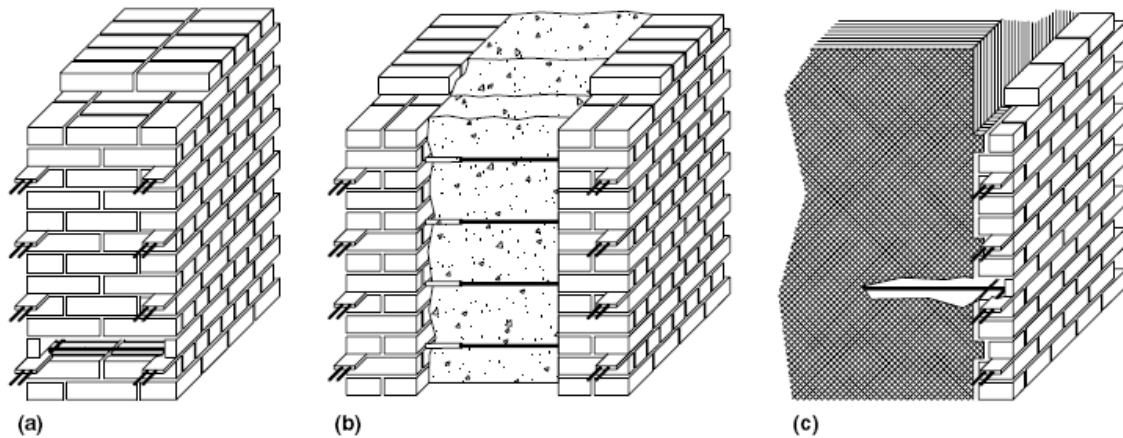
Example of application of the technique on different types of brick masonry walls: (a) solid bearing wall; (b) multi-leaf wall; (c) multi-leaf wall with external veneer wythe.
